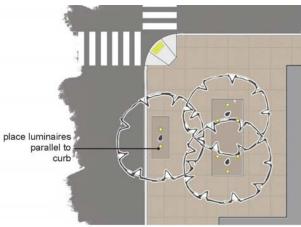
Branching trees uplighting plan view, wide planter, corner condition
